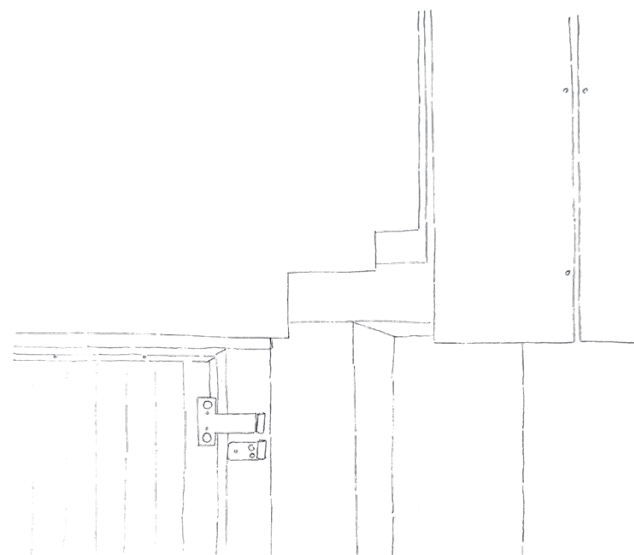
Detail of the connection between garage, wall and balcony of the building on Daltorpsgatan 15-21.
